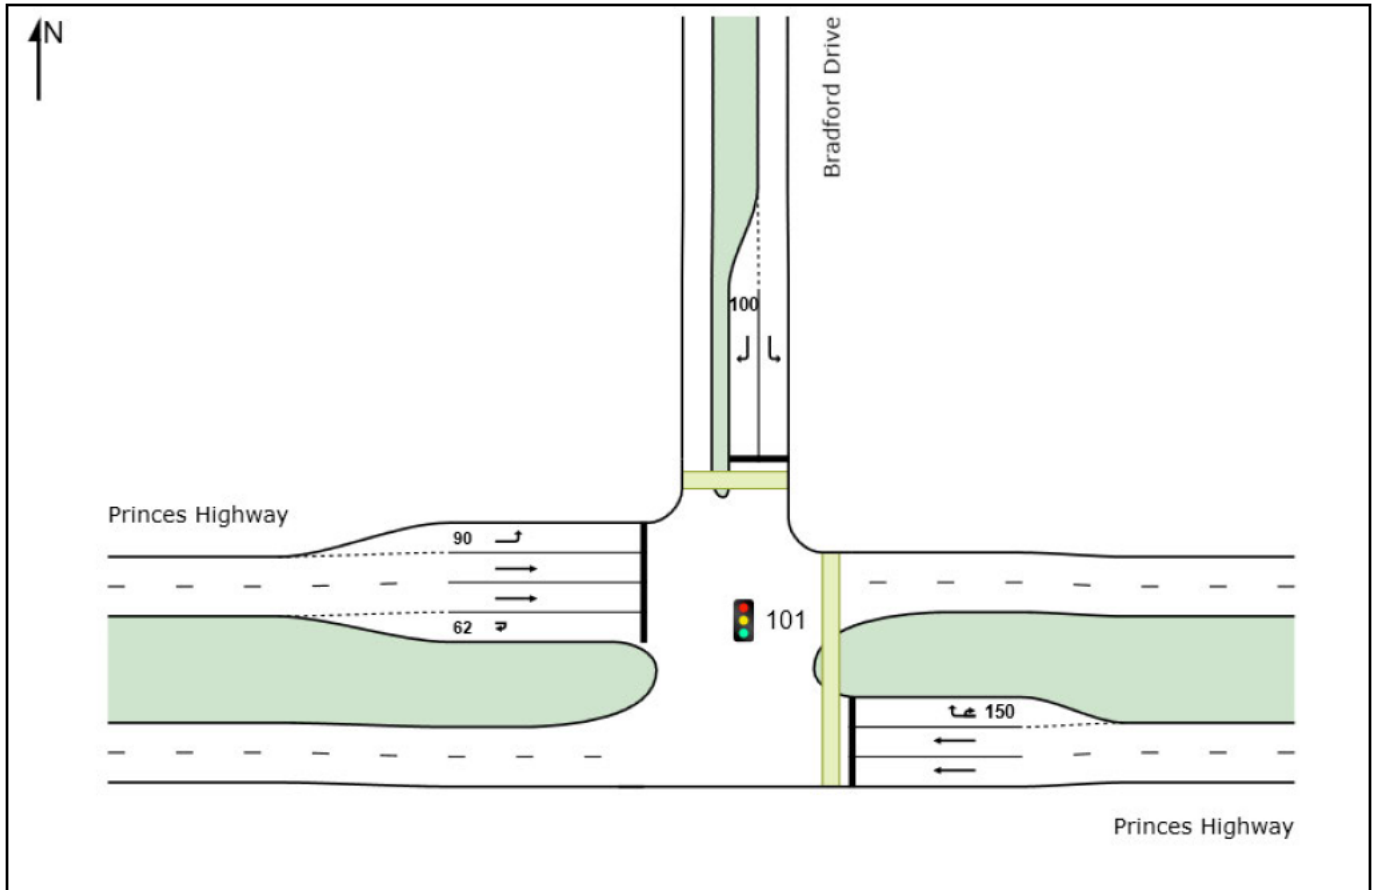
Potential Princes Highway / Bradford Drive signalised intersection layout (Source: SIDRA)
